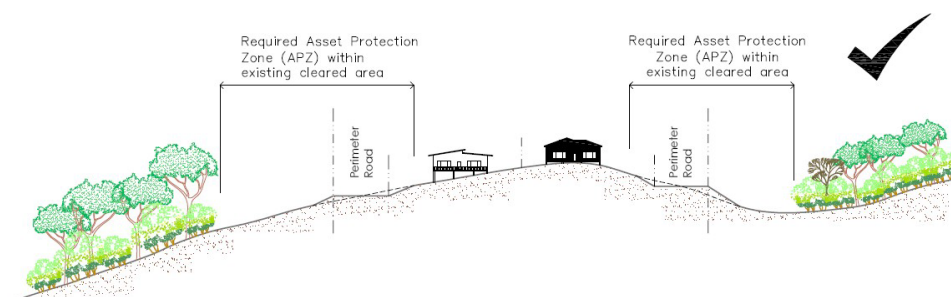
Subdivision layout with Perimeter Road and Asset Protection Zones (APZ)
